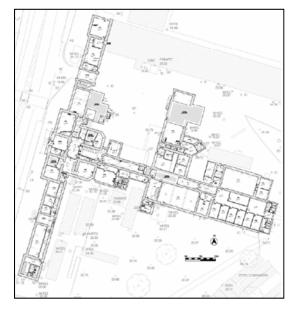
Plan of Grangegorman building demonstrating the layout. To view in large format see [13]
